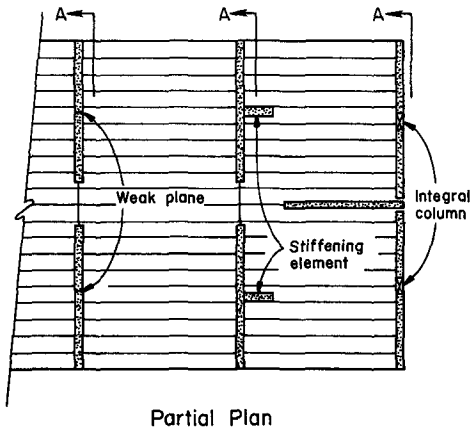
Cantilever mode—Single vertical wall panel stack.
